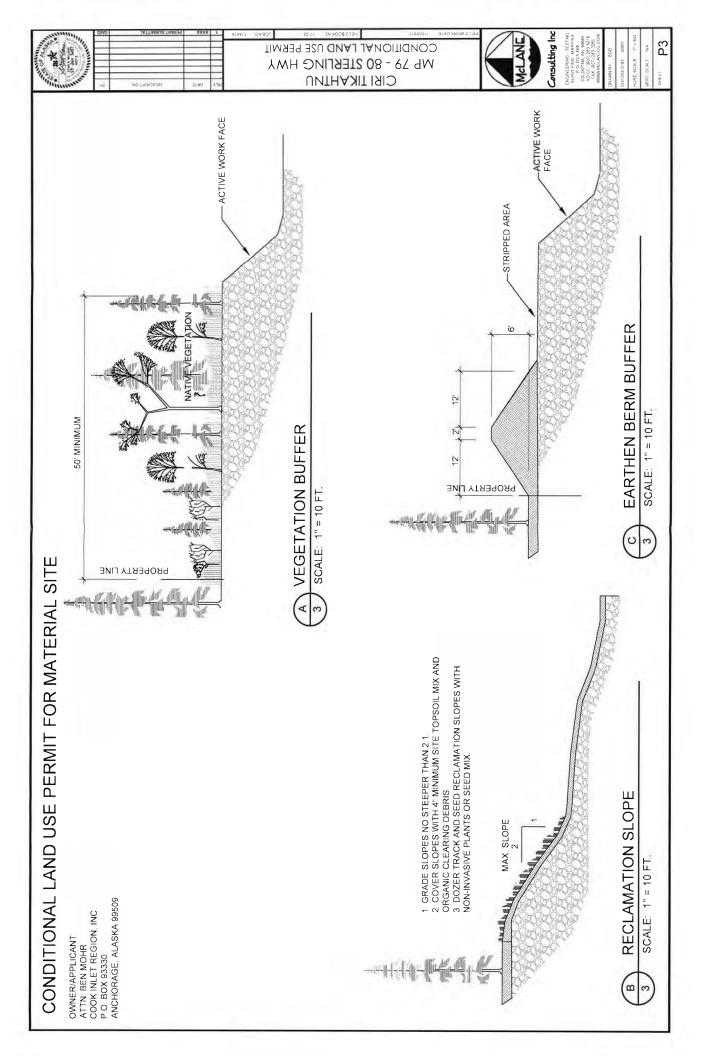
EXHIBIT A - SAND AND GRAVEL EXTRACTION CONTRACT STERLING GRAVEL PIT
